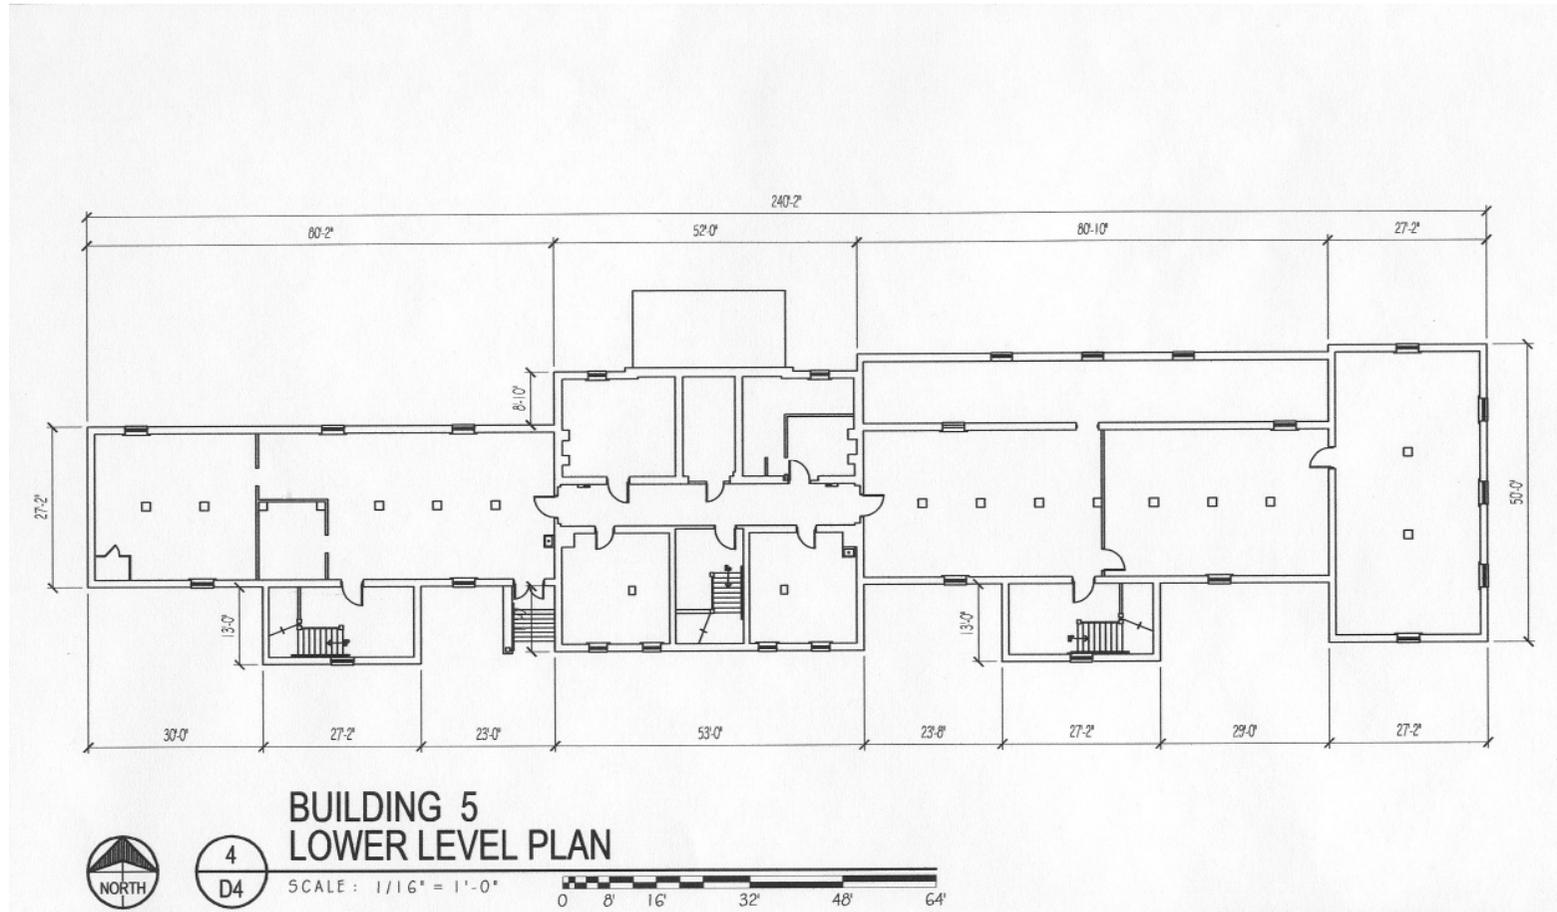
Basement-level floor plan of Building No. 5 showing existing conditions (Walton and Associates 2003).
